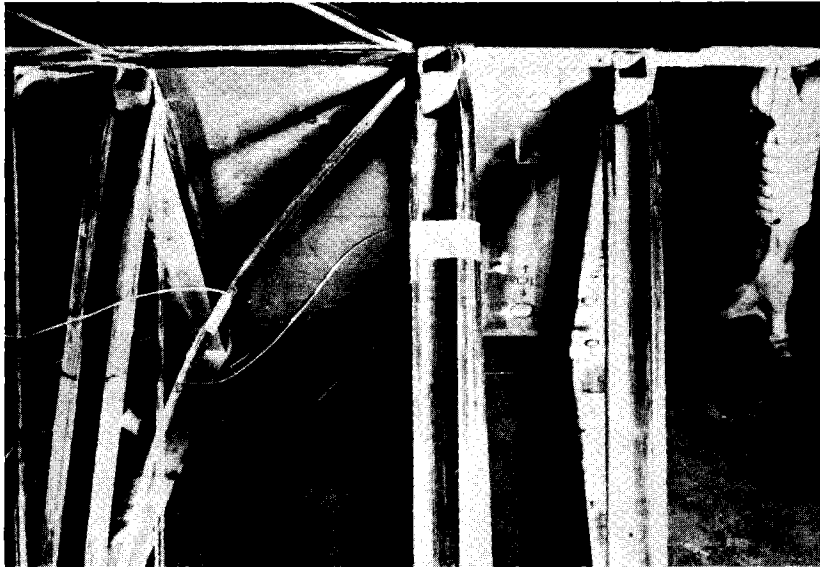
Failure of TTG-10 due to joint failure between lateral stiffener and plate. Buckled web diagonal was caused by movement of stiffener.
